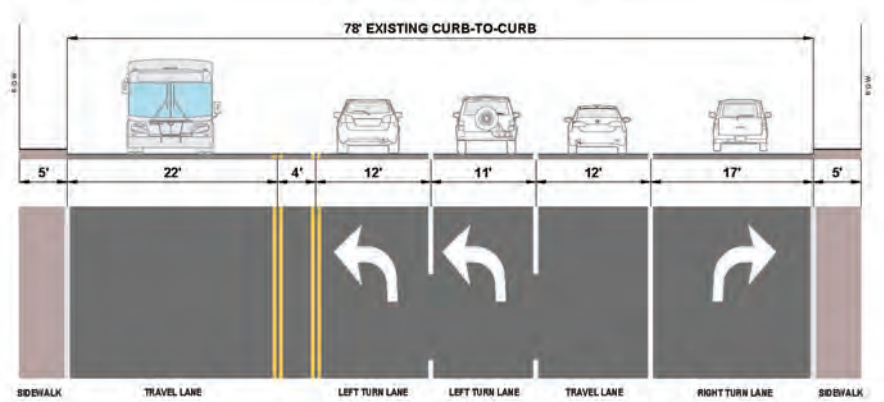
Newbridge Street Existing Typical Section From Saratoga Avenue To Willow Road (Facing West)
